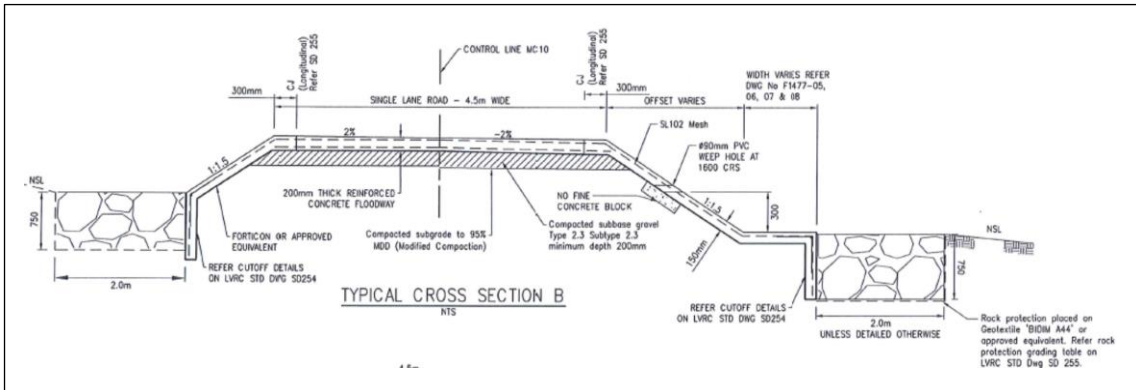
TYPICAL CROSS-SECTION FOR SECTION B [18]
